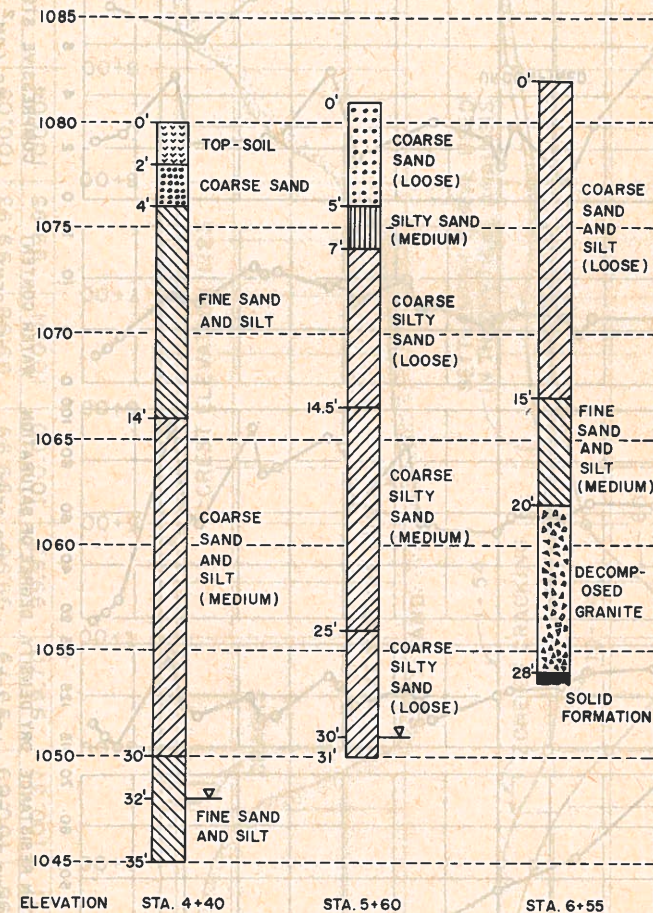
WOODCREST DAM: LOGS OF FOUNDATION TEST HOLES
